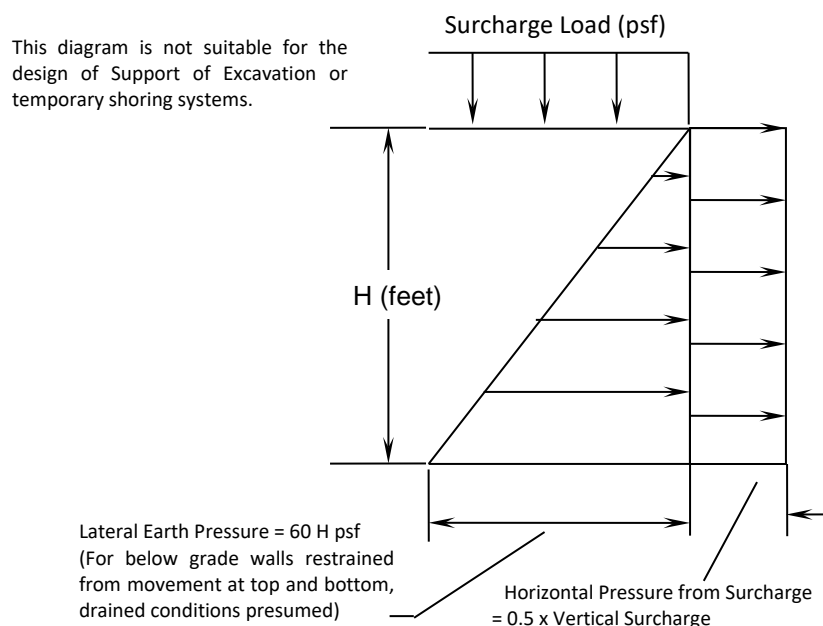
Lateral Earth Pressures Diagram – Drained Elevator Pit Wall
